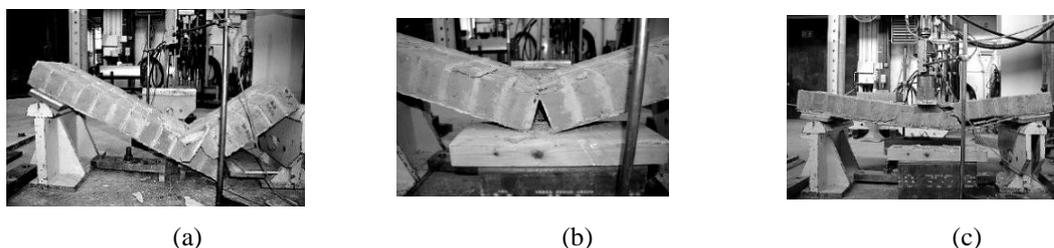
(a) Failure of specimen C1_co due to fibres rupture, (b) Failure of specimens G3_co due to fibres rupture, (c) Failure of specimen G7_co due to shear diagonal tension.
